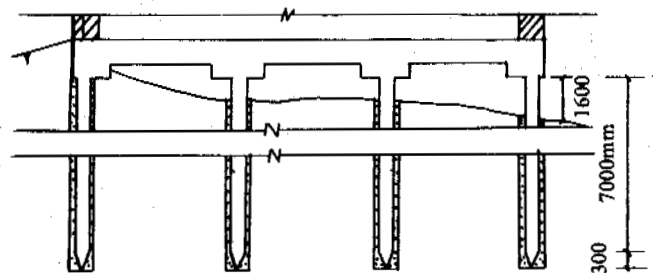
Ventilated and insulated base with reinforced concrete plug-in piles and whole circle beam
